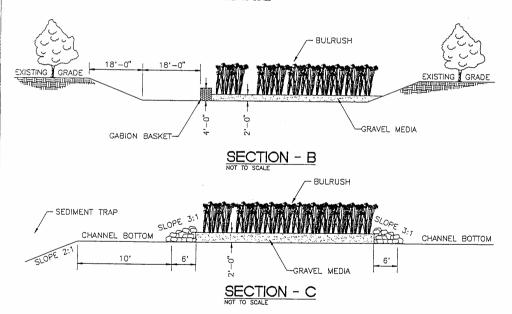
D HANNABE-WALKER CONSTRUCTED WETLAND DETAIL
